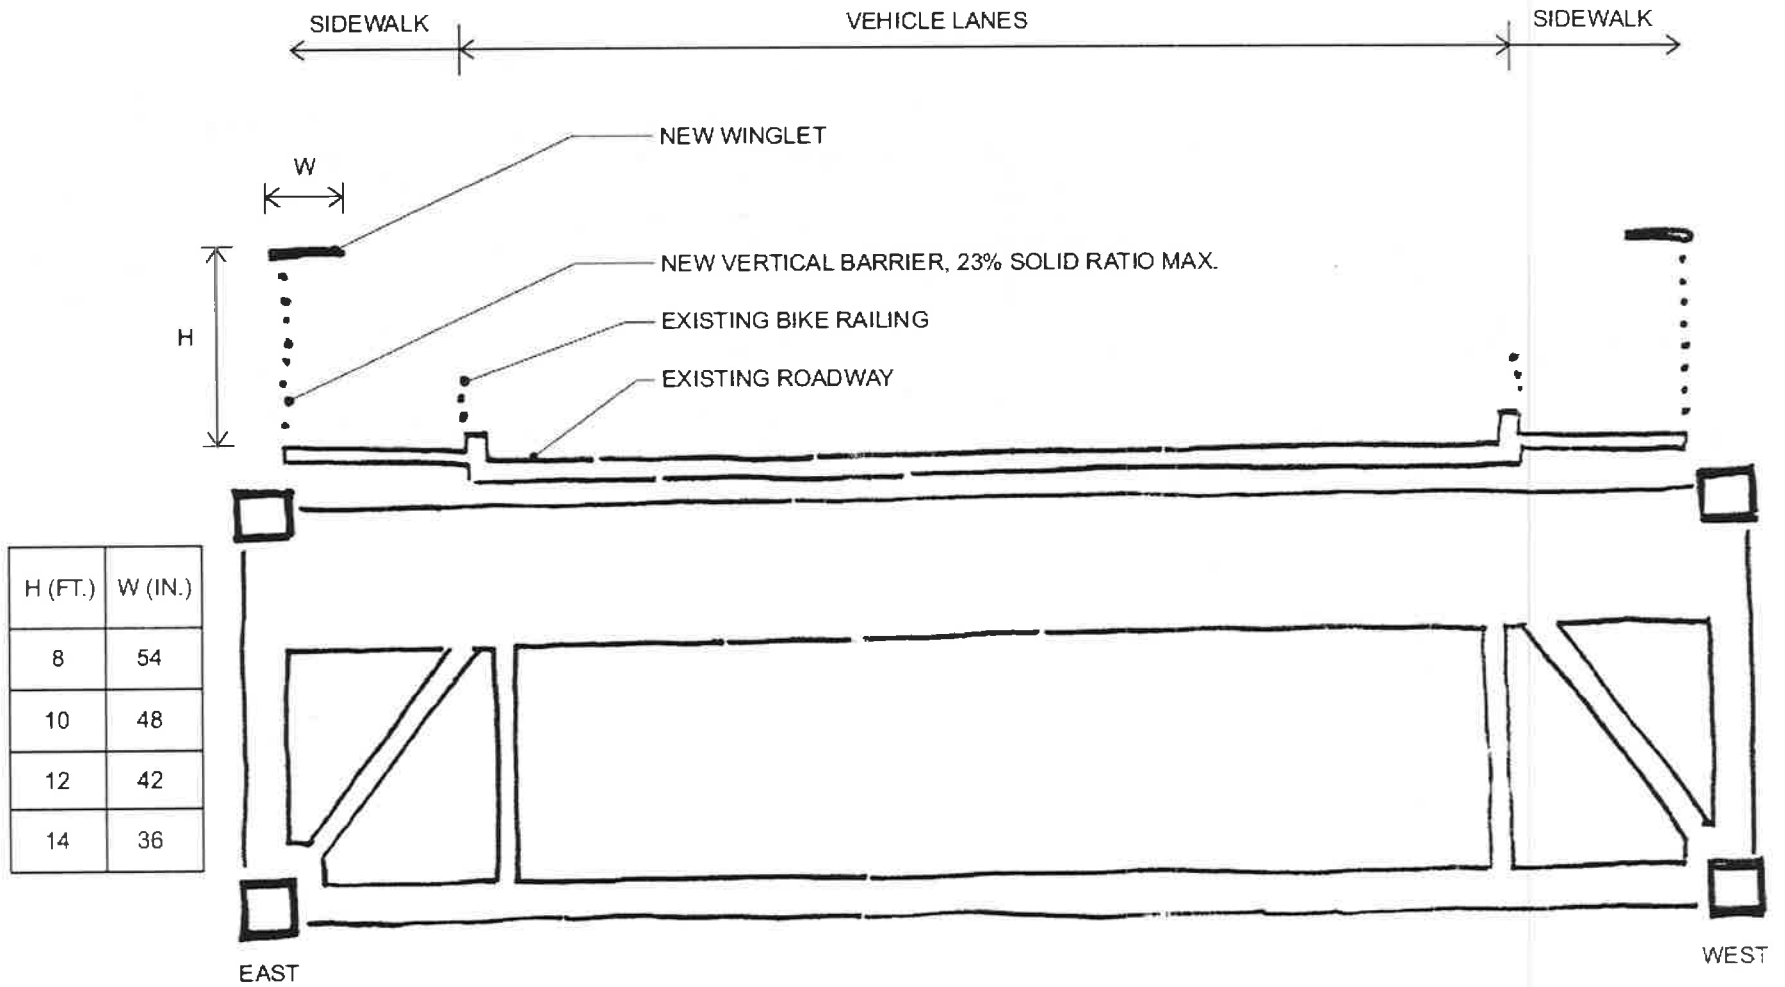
CONCEPT 2 : REPLACING THE EXISTING RAILING ; WINGLETS MOUNTED OVER BARRIER
